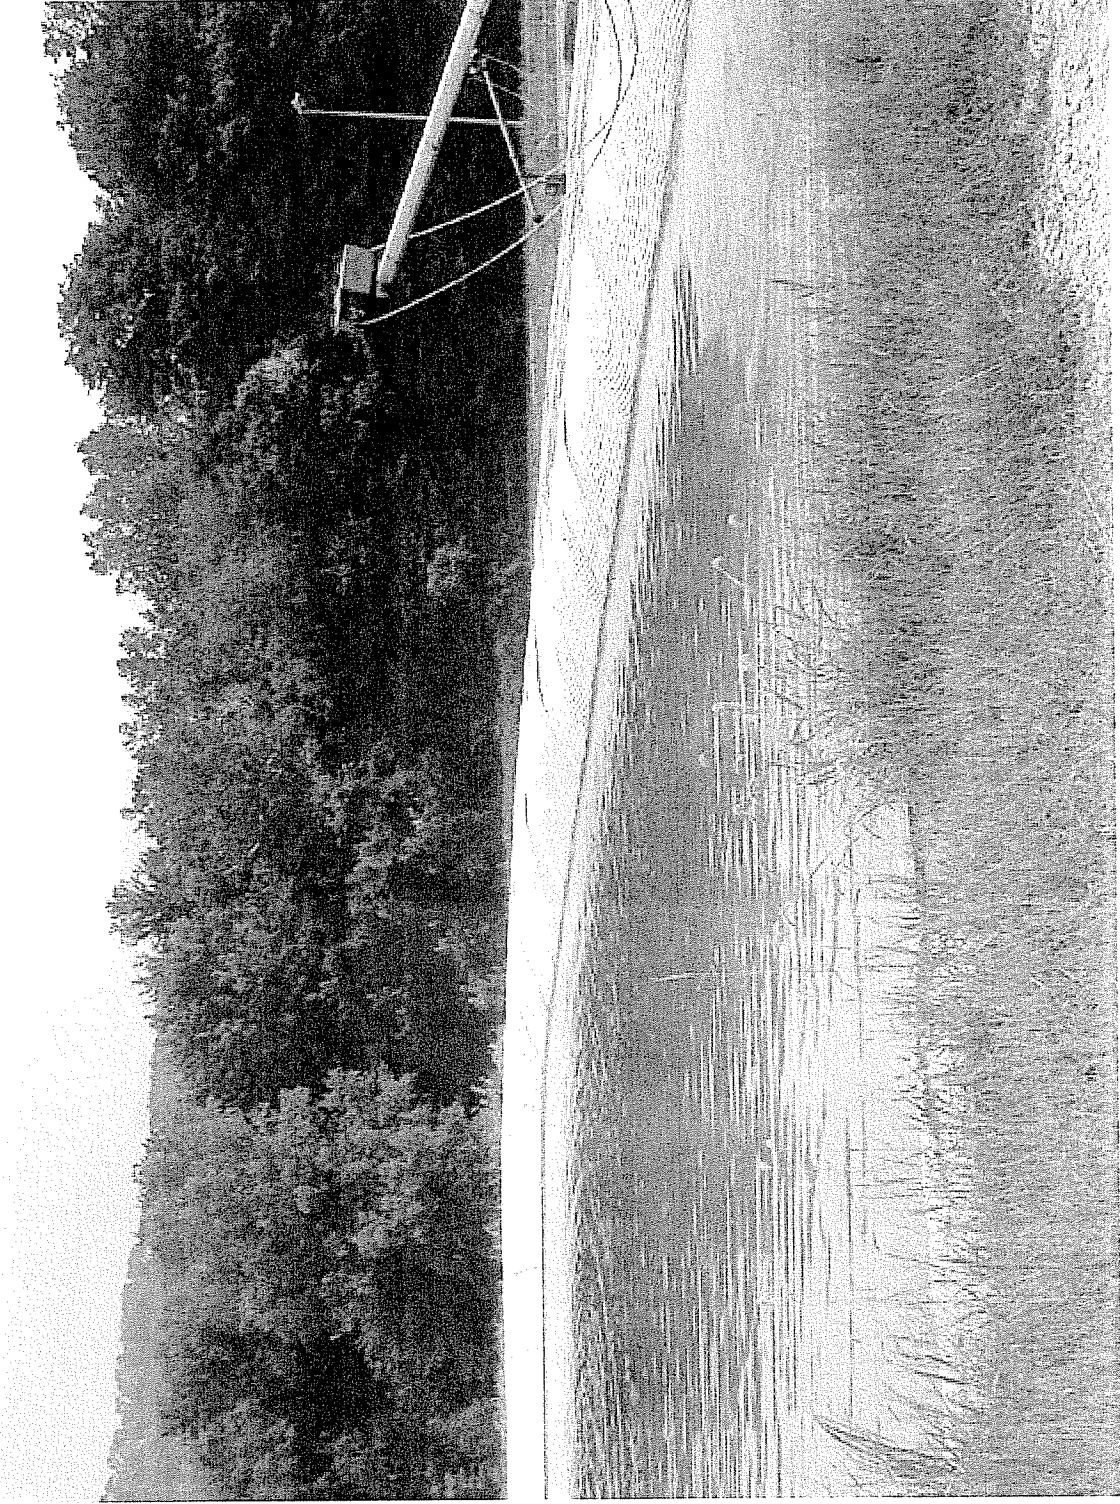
Primary Lagoon with Monitoring Equipment on Right.
